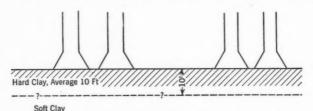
HARD CLAY CRUST SUPPORTING FOUNDATION PIERS FOR BUILDING
